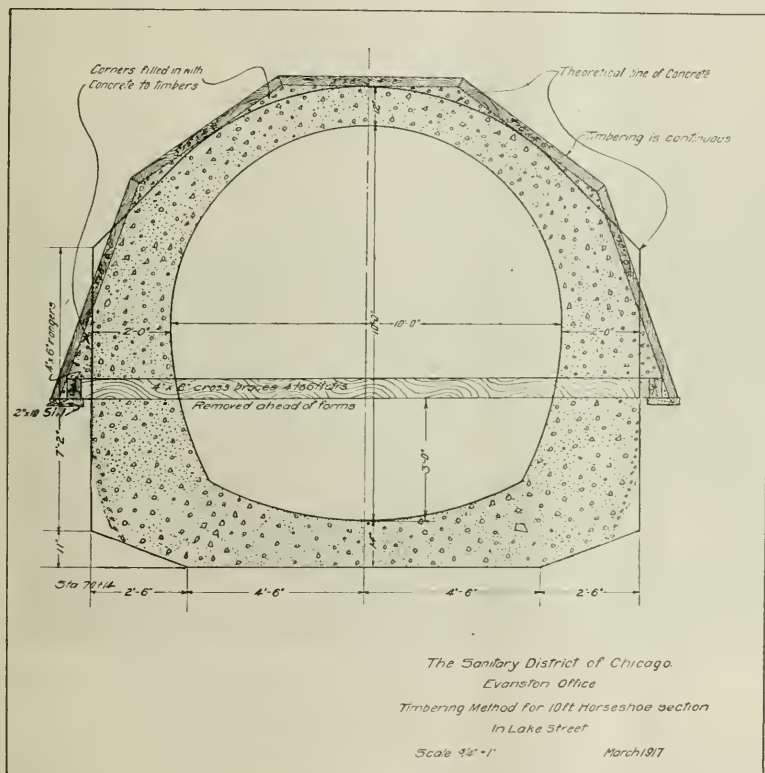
Evanston Sewer. 10 ft. Outfall Sewer, Section Showing Timbering Method.
